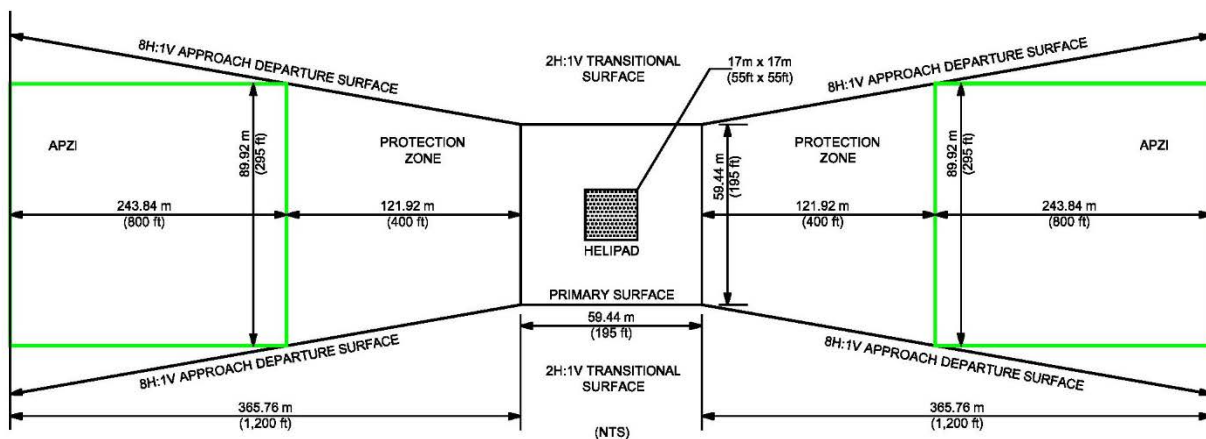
Elevated Helipad Layout Criteria for CH-47 and Larger Helicopters (8H:1V)
